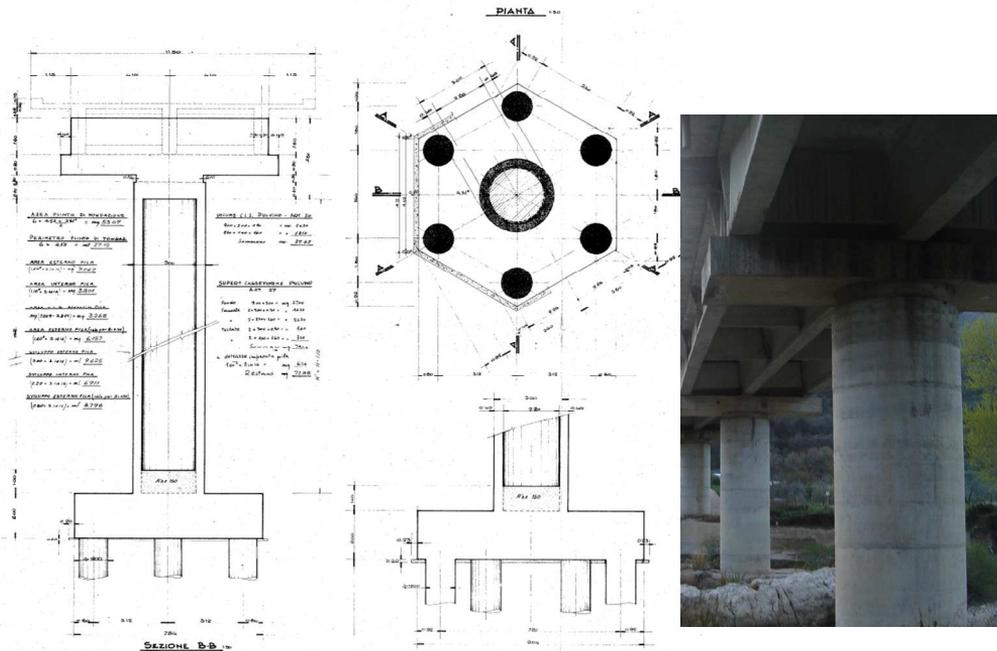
Example of viaduct whit hollow circular piers and on piles foundations
